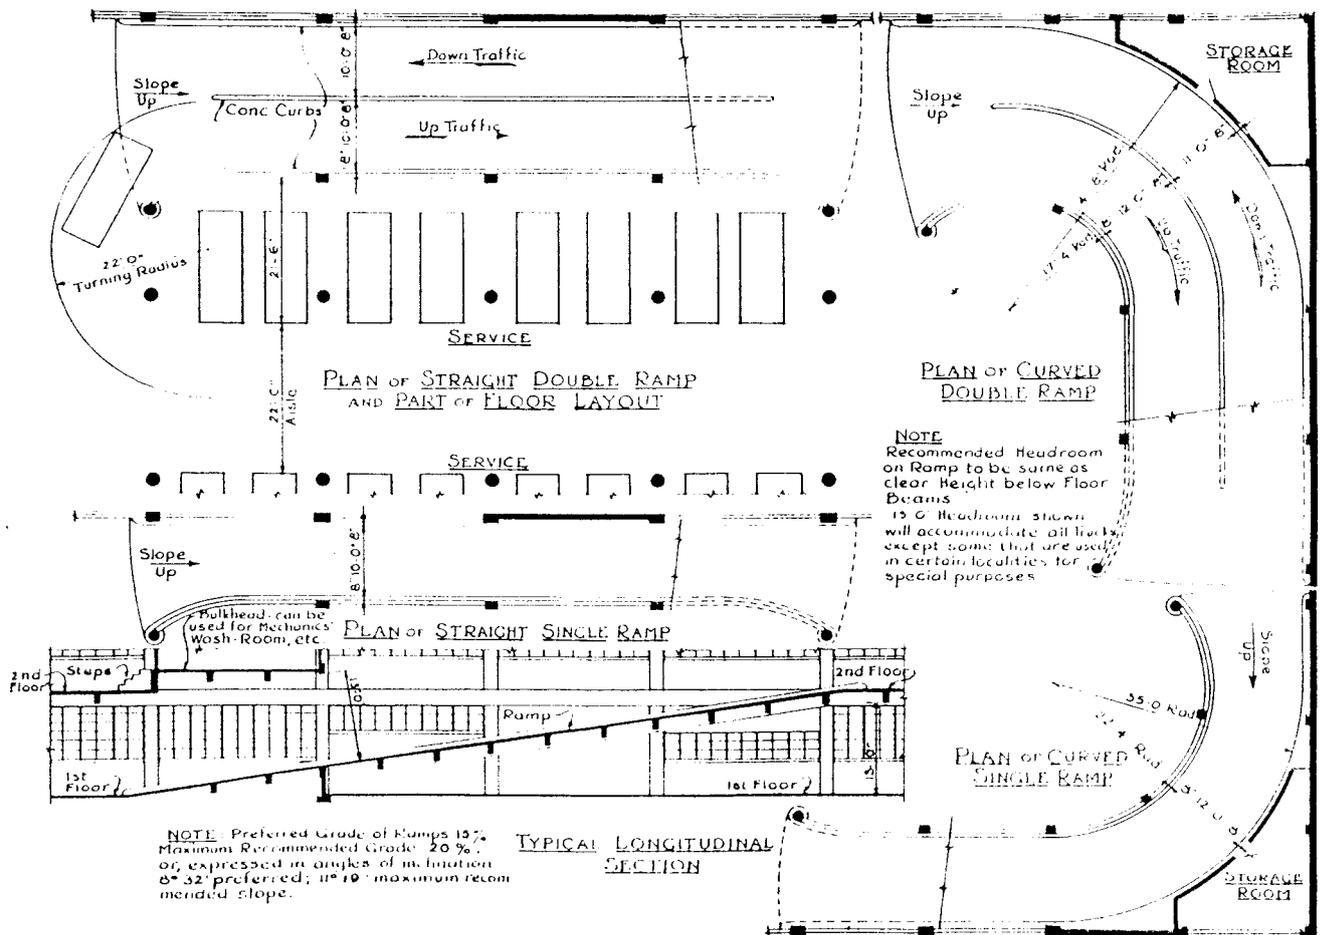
Ramp design. (Chevrolet Motor Division, Building Department, Detroit, Mich.)
